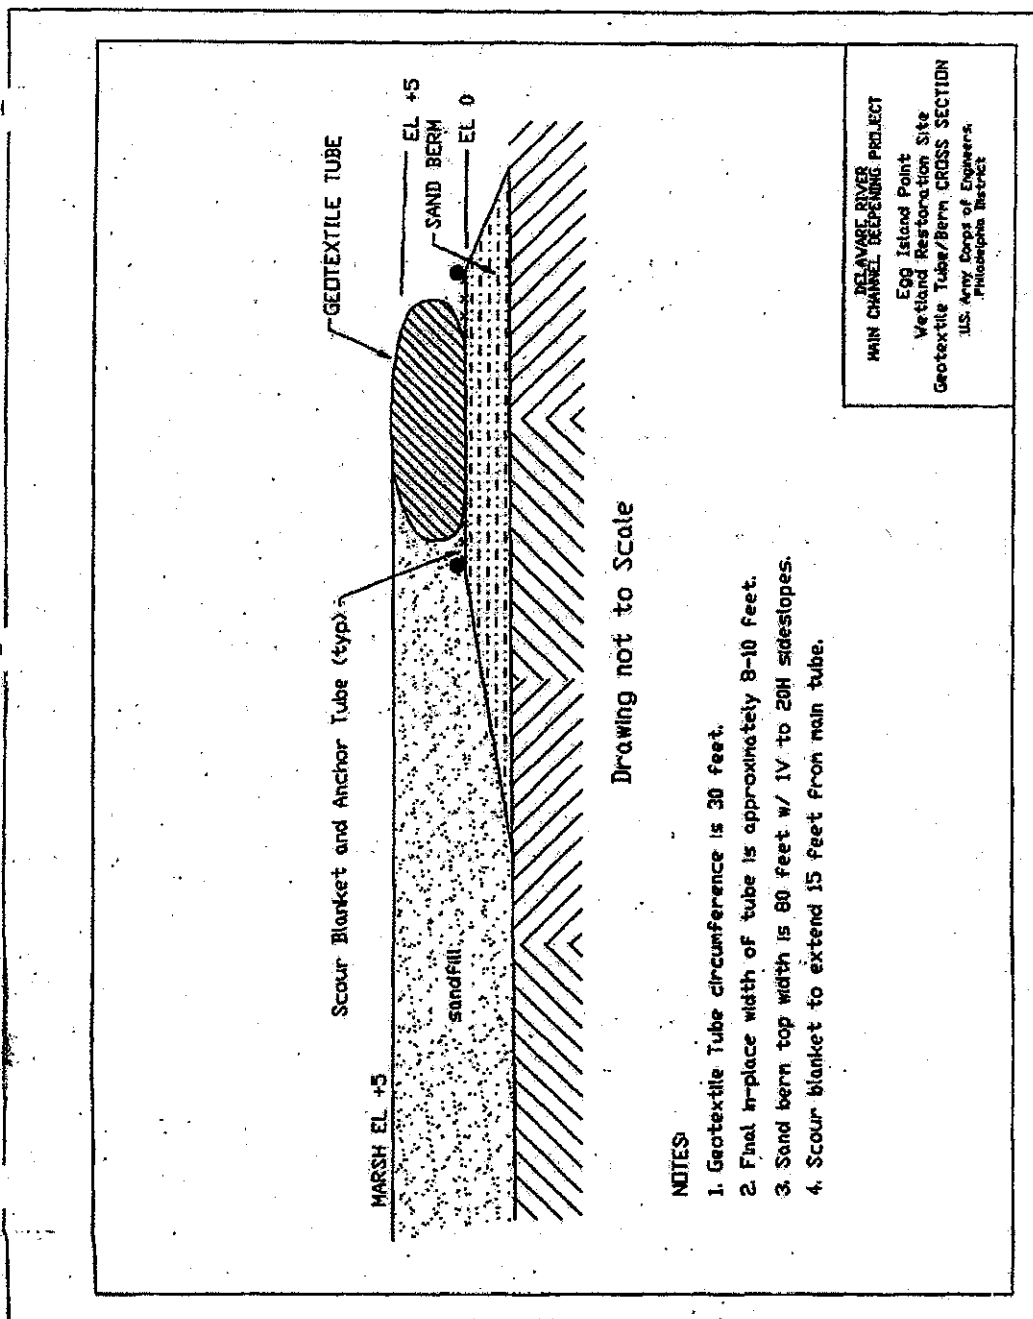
Egg Island Point Geotextile Tube/Berm Cross Section.
